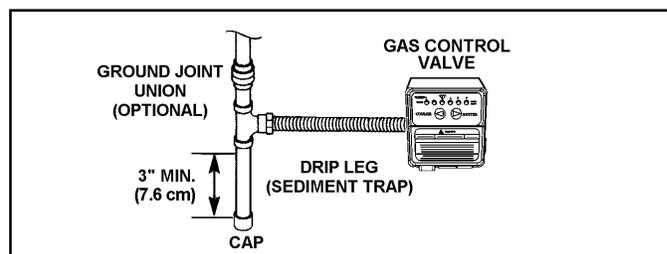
GAS PIPING WITH FLEXIBLE CONNECTOR.
